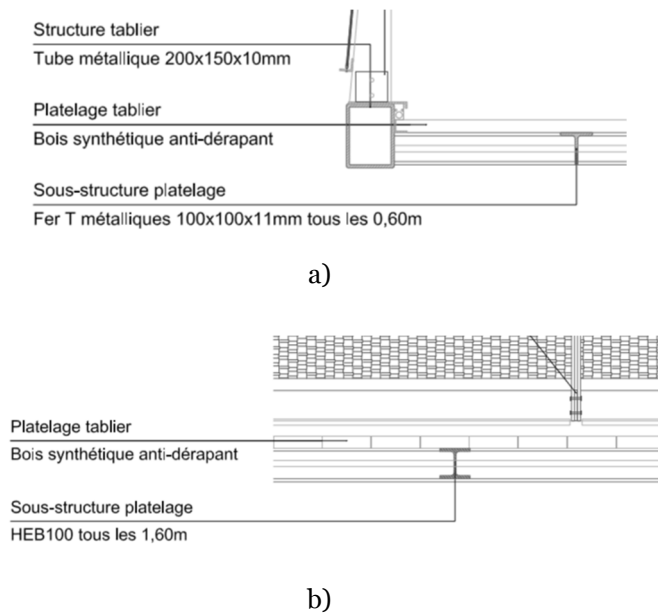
Details of deck structure: a) transversal view; b) longitudinal view.
